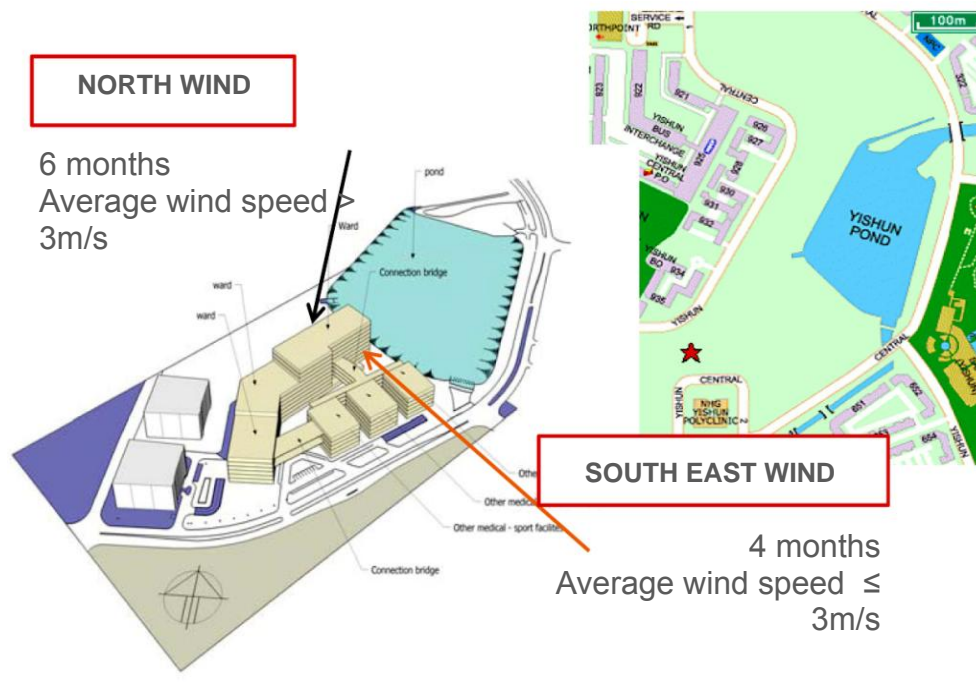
Site Layout, building shape and layout to enhance natural ventilation (CPG Architects, 2009)
